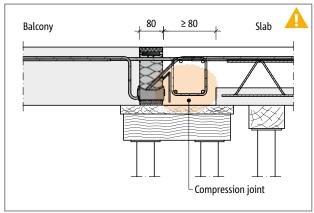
Schöck Isokorb® T type K-E, K-T: Installation in conjunction with prefabricated slab with edge beams, compression joint on the floor side
